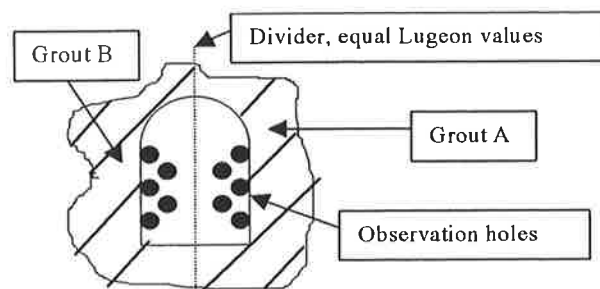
Principal layout. Divided fan and corresponding observation holes.
